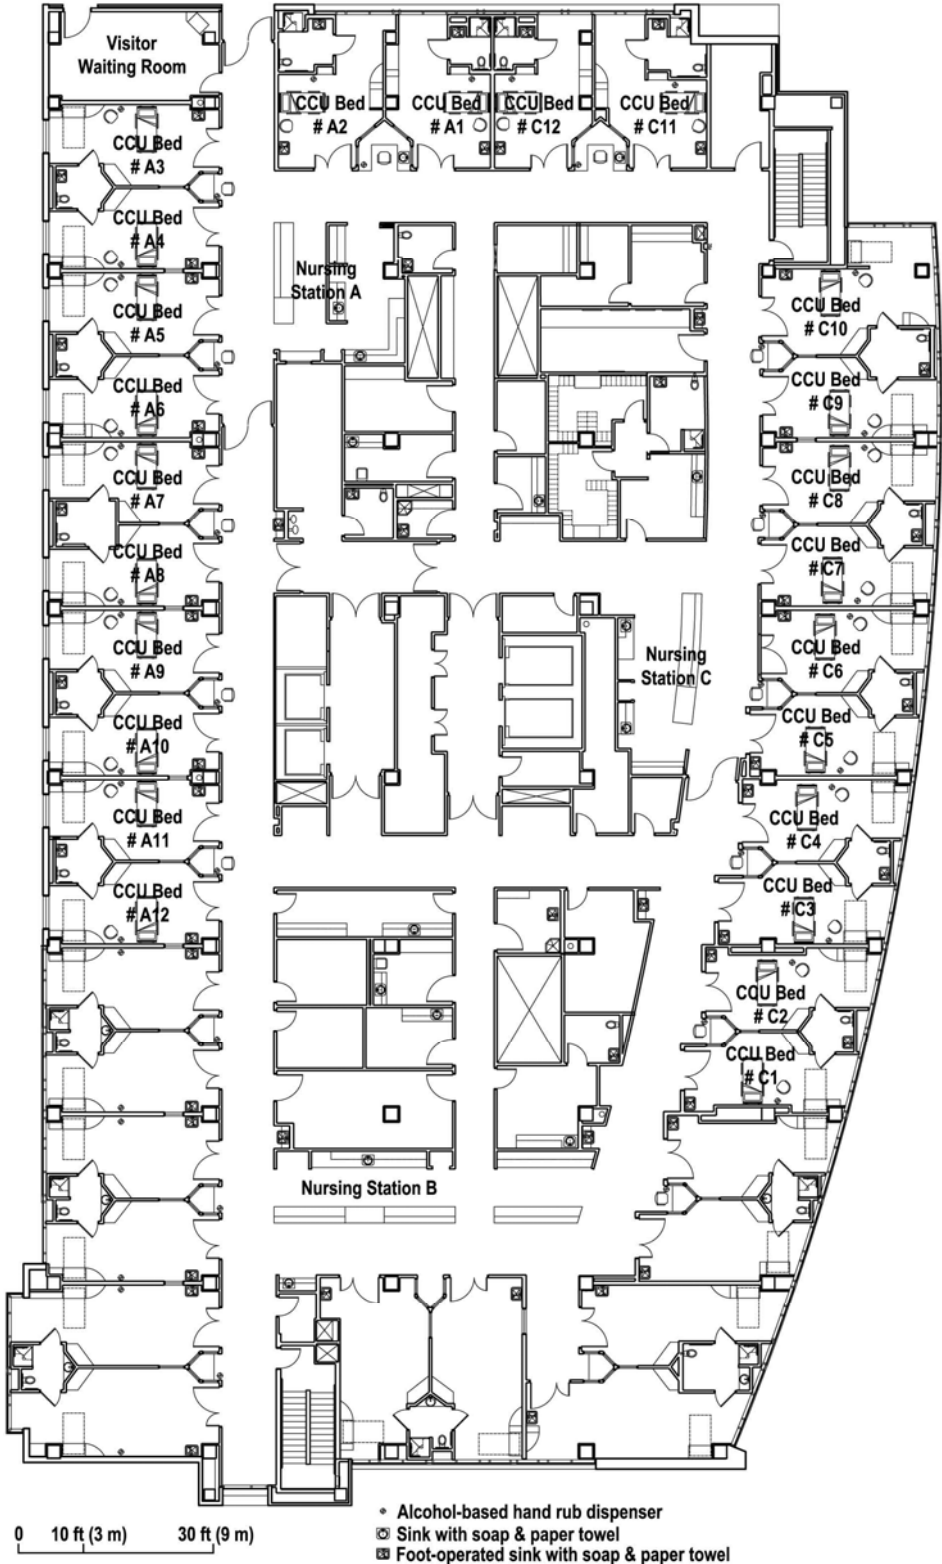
Layout of the New CCU (adapted from architectural drawings provided by WHR)
